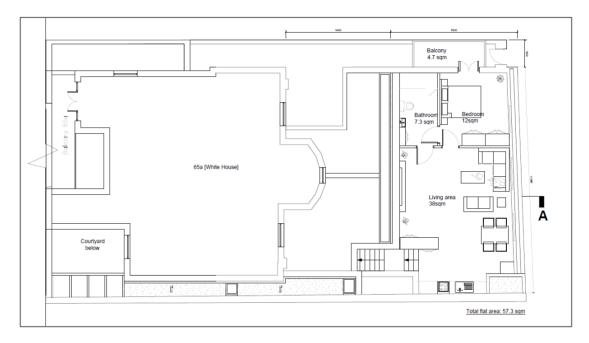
Proposed Plan of First Floor Extension (Contemporary Design Solutions, 2020)
